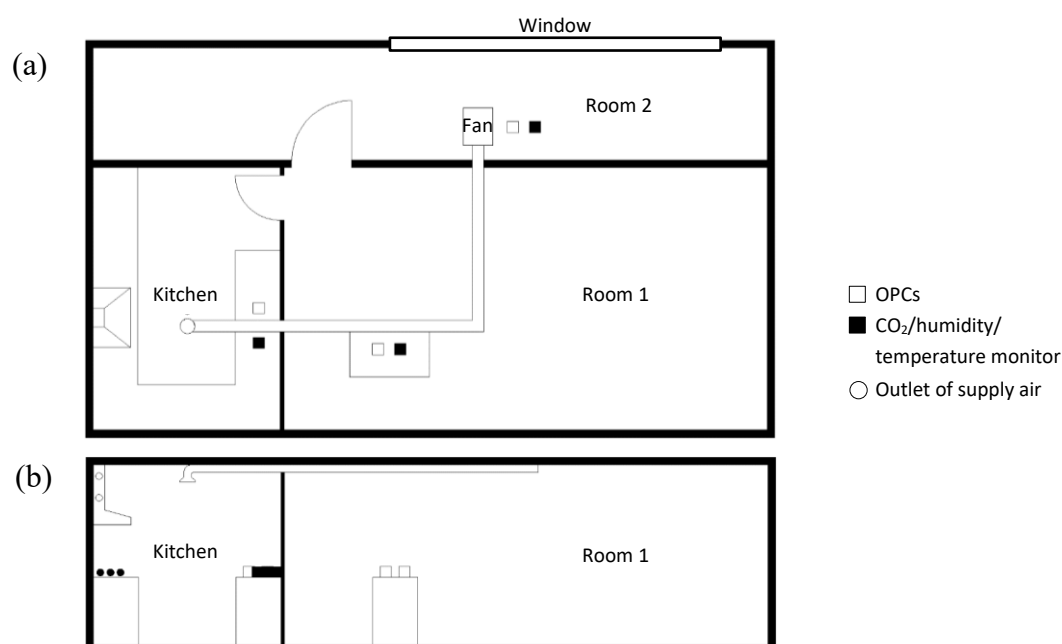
(a) Schematic floor plan and (b) cross-section of the testbed. Ductwork connected a fan located in room 2 with the kitchen.
